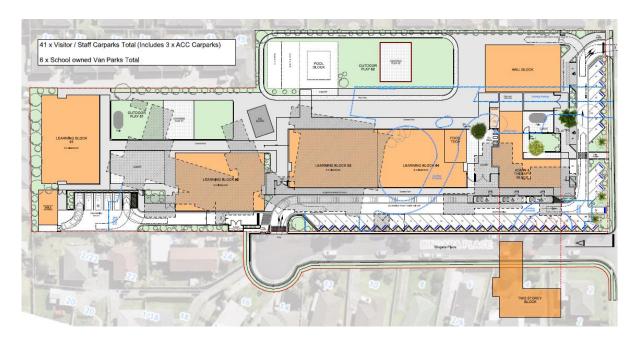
Proposed Site Plan (Source: Brewer Davidson 2022)
